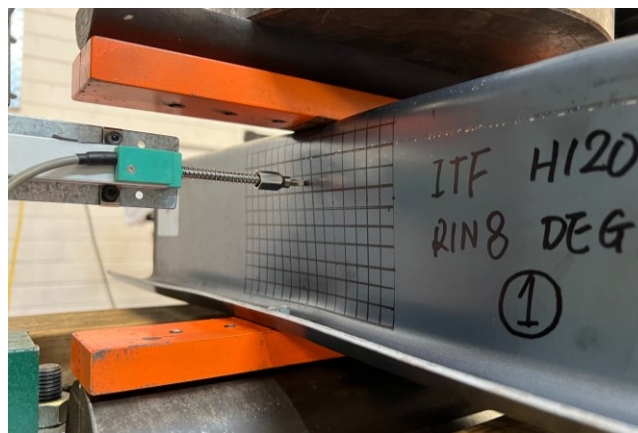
Out-of-plane bending for ITF loading case, 8 mm radius section
